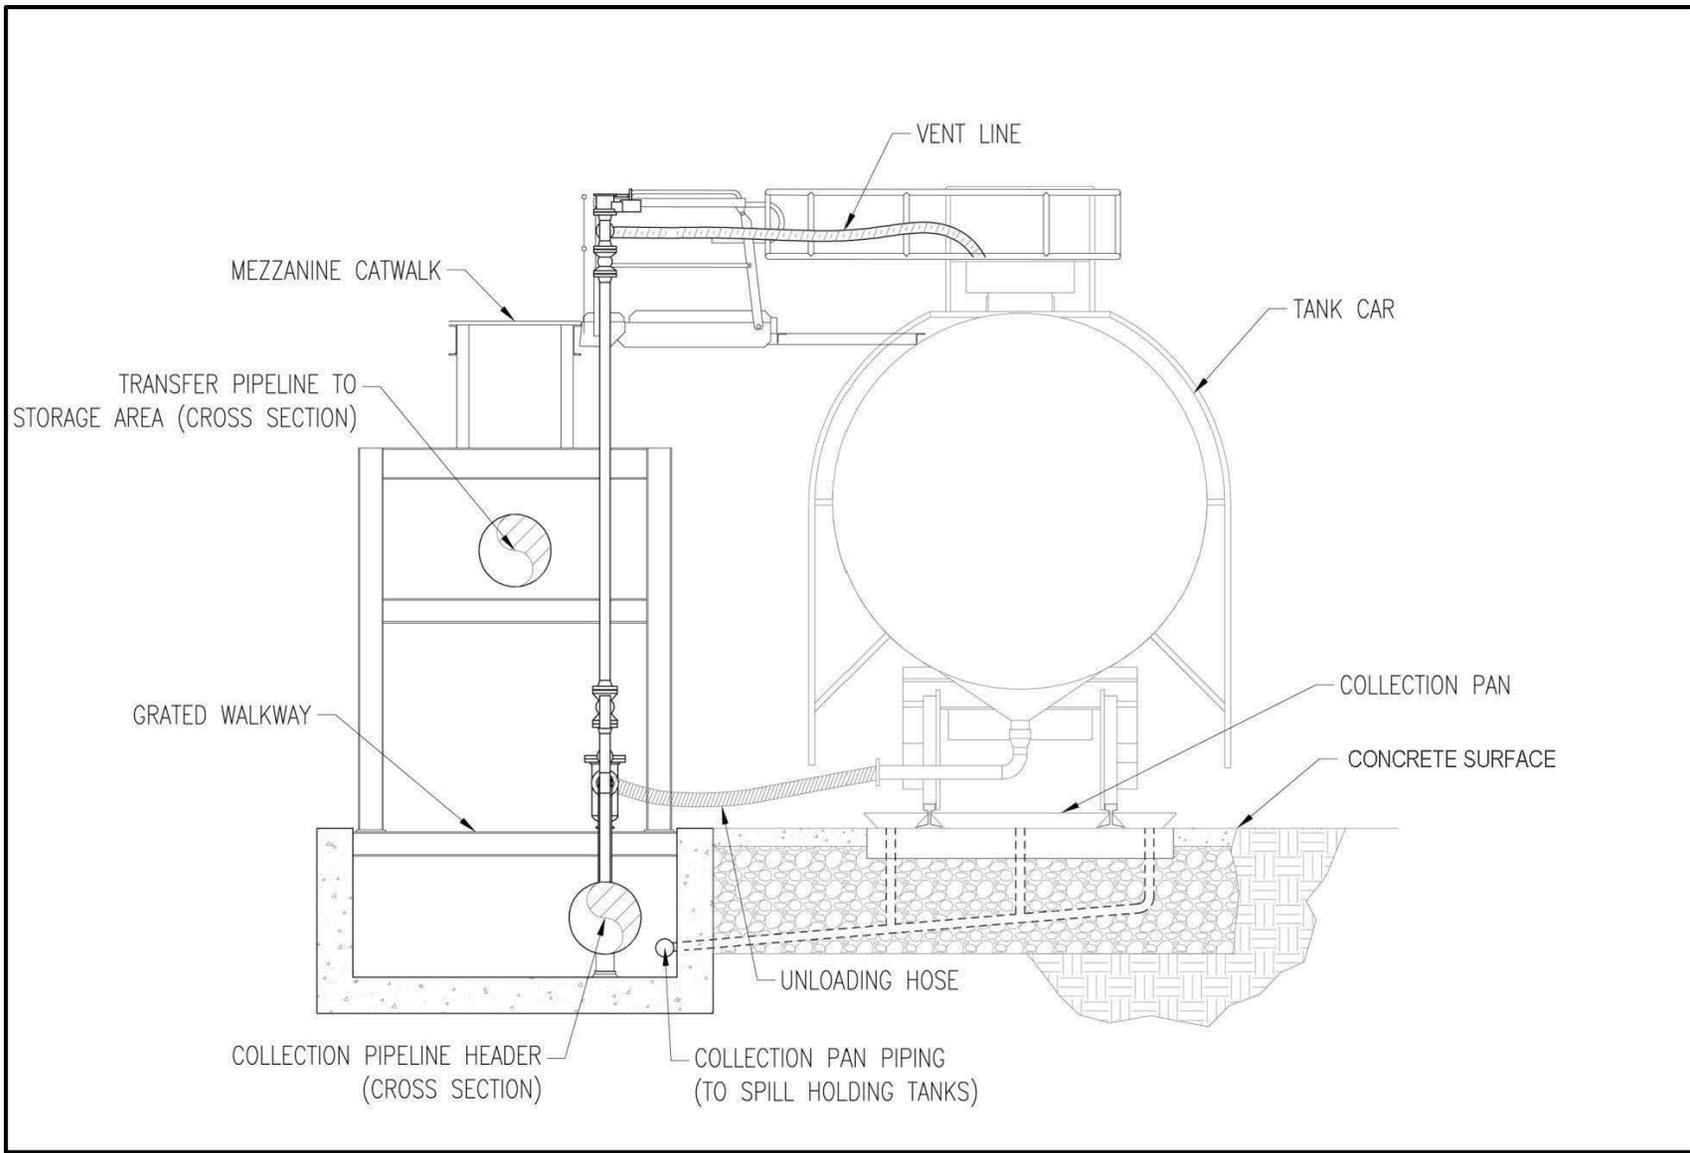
Rail Car Unloading Facility Cross Section (Revised)
